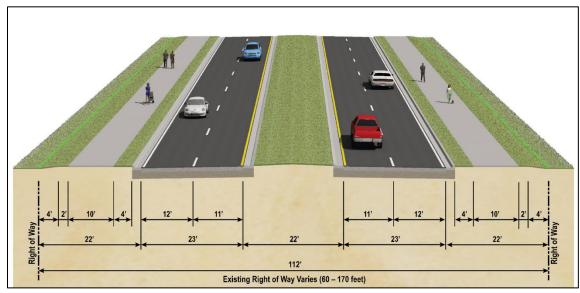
Segments 2 - 7 Preferred Typical Section from North of Avenue Y to LaVista Drive.
